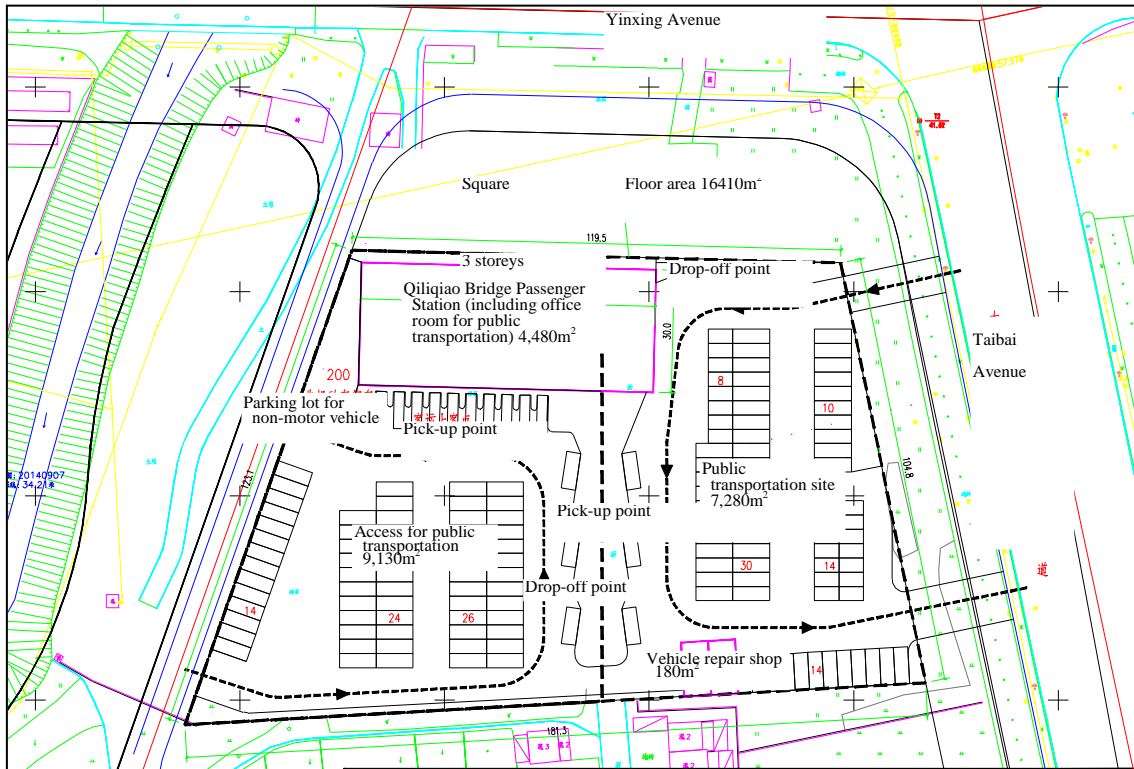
Sketch Map of Plane Layout of Qiliqiao Bridge Hub
